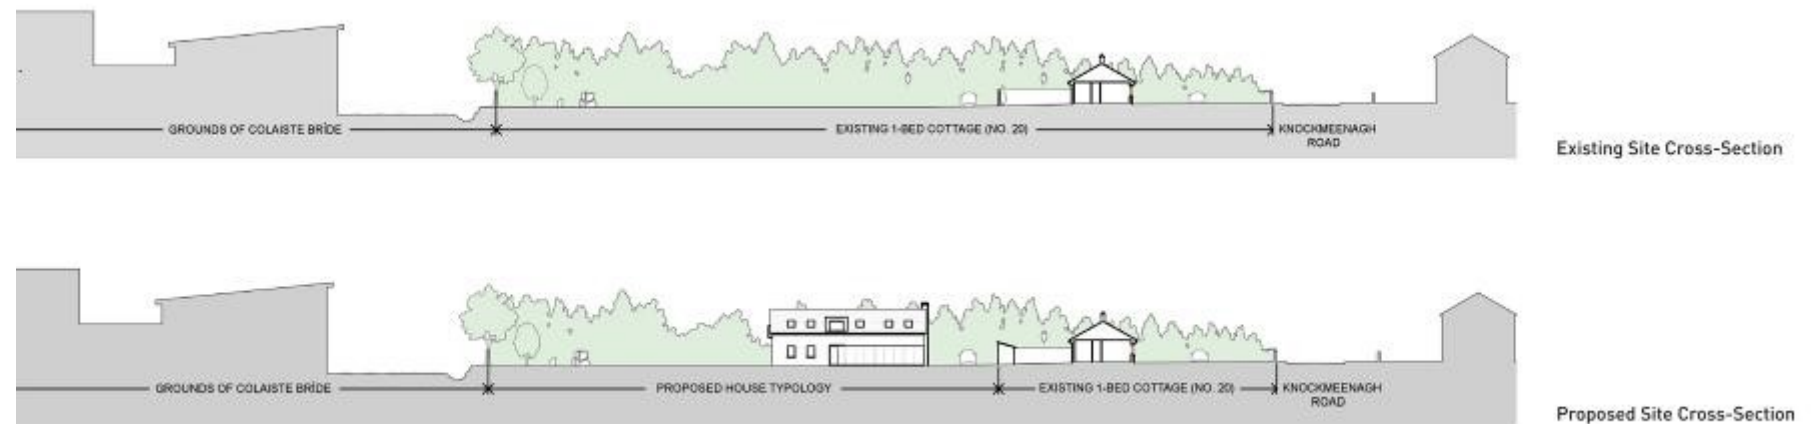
Cross sections of an existing site showing building heights and plot sizes before and after development.
